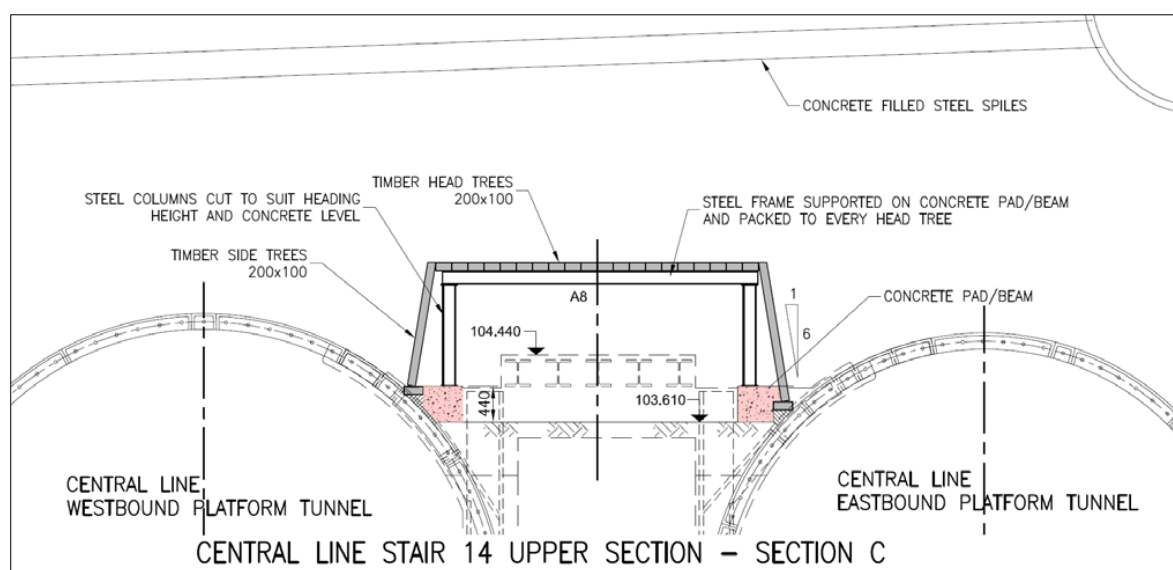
Detailed cross section of stair 14 (Aslte et al. 2013)
